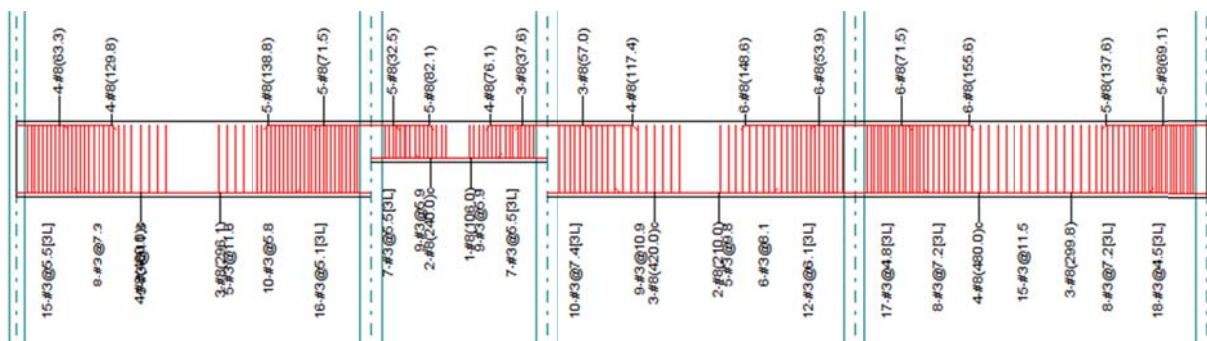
spBeam Column Line L Reinforcing Diagram (Lateral Loads)
